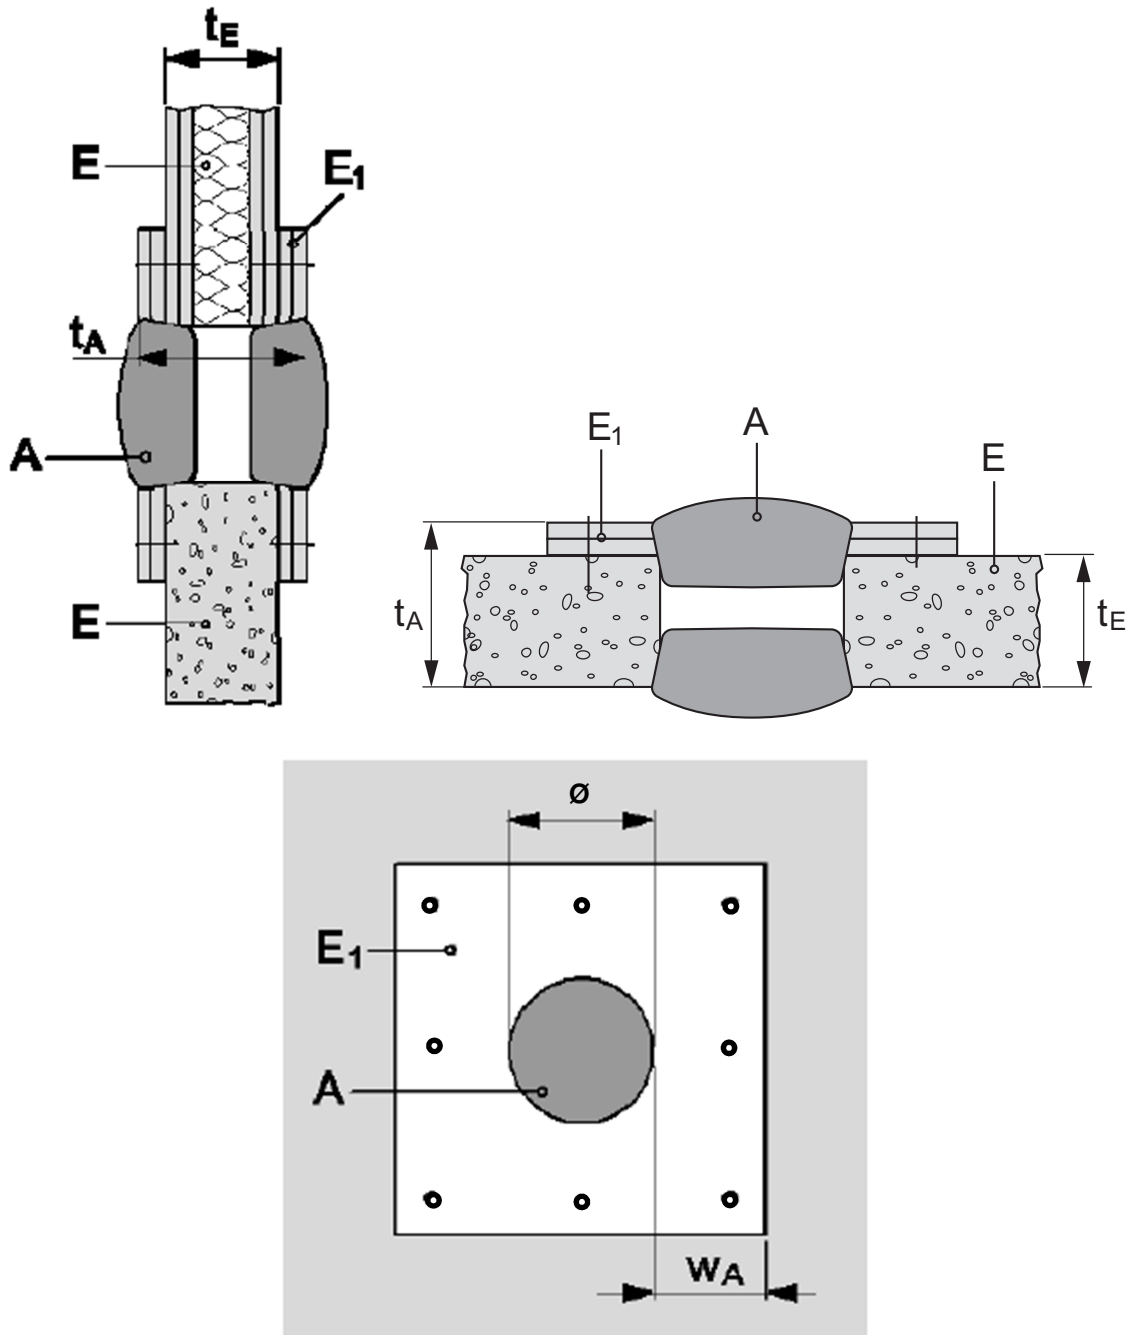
Aperture framing / beading and position of the seal in walls / floors
